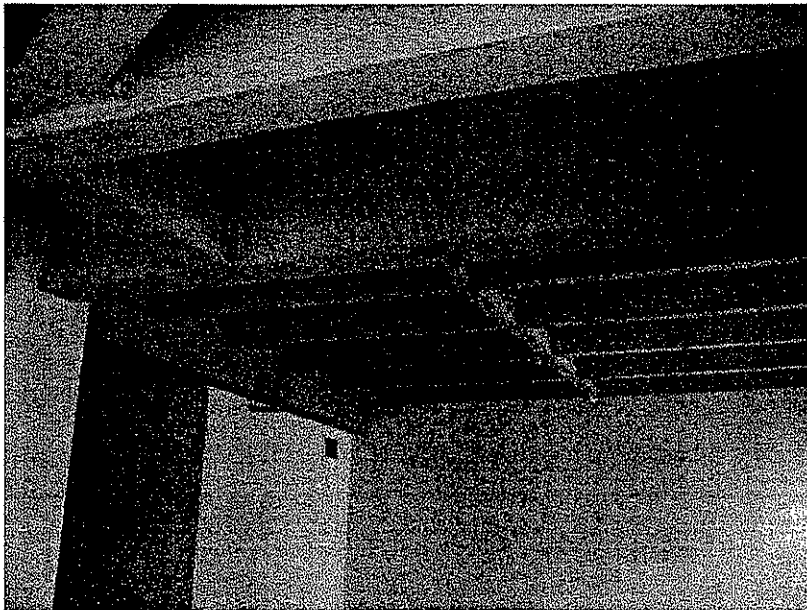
Interior of living space- typical. Main volume of space is at full ceiling height of exposed concrete ceiling, entrances, kitchens and bathrooms had new ceiling installed at 8 feet plane.
